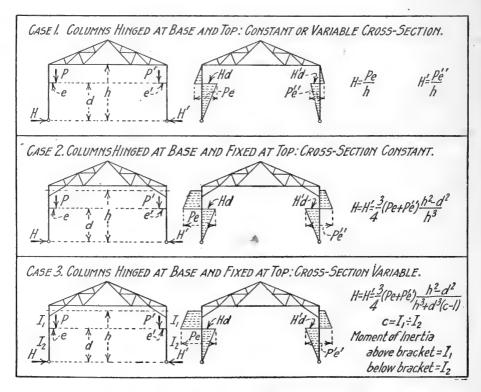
Stresses in Mill Building Columns Carrying Crane Loads.
